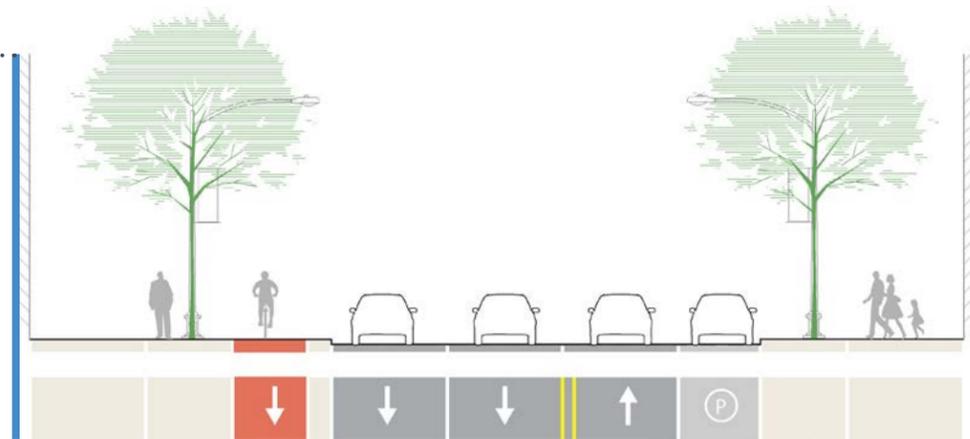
Fifth Street typical section Brazos Street to I-35
